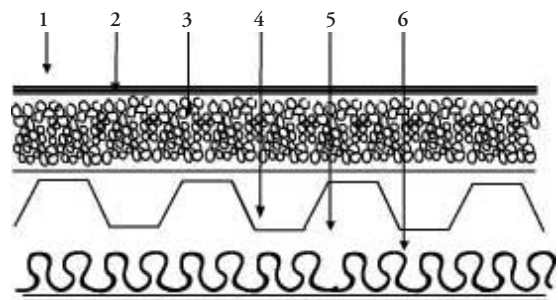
Proposed wall: R-13 batt insulation covered by R-12 rigid foam board.
